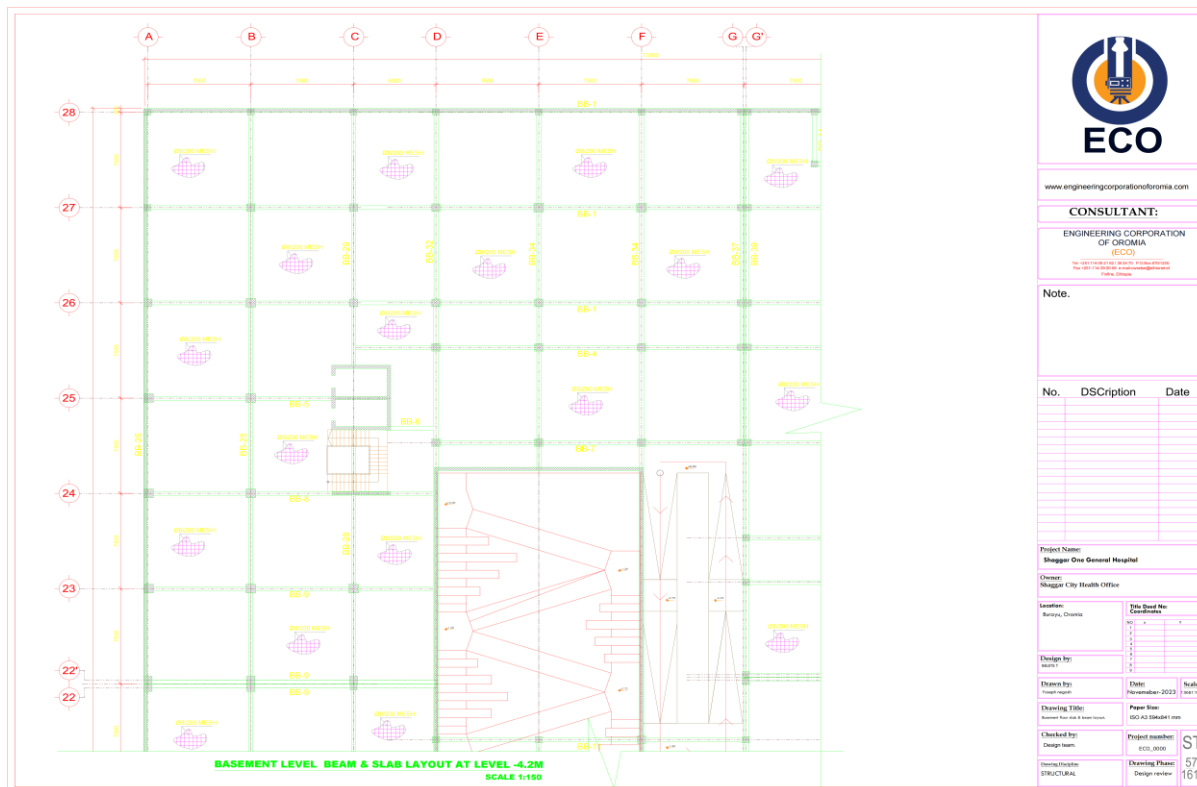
Basement Floor Slab and Beam Layout of MHB.
